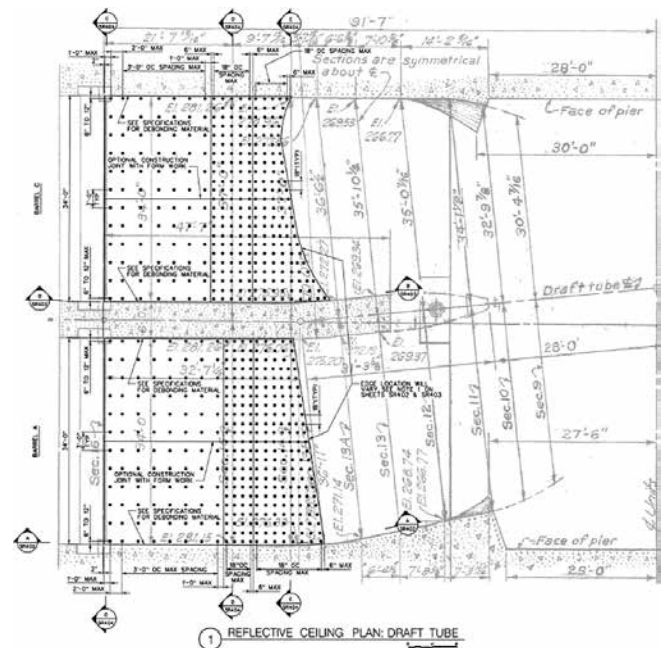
Reflective ceiling plan for reinforced shotcrete modifications to draft tube
